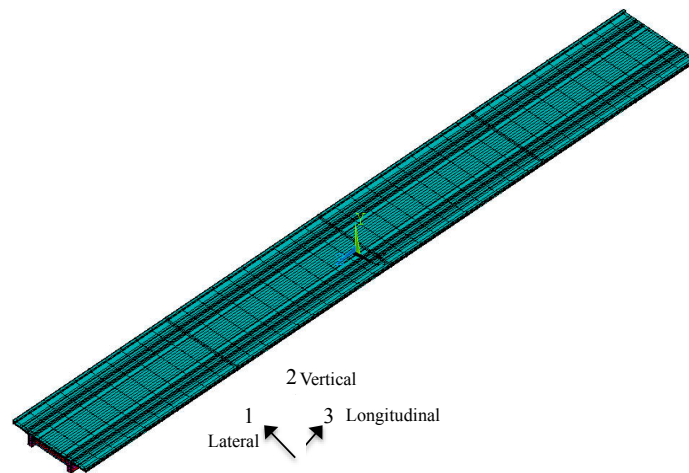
Finite element model of a twin-I girder bridge with precast concrete deck.
